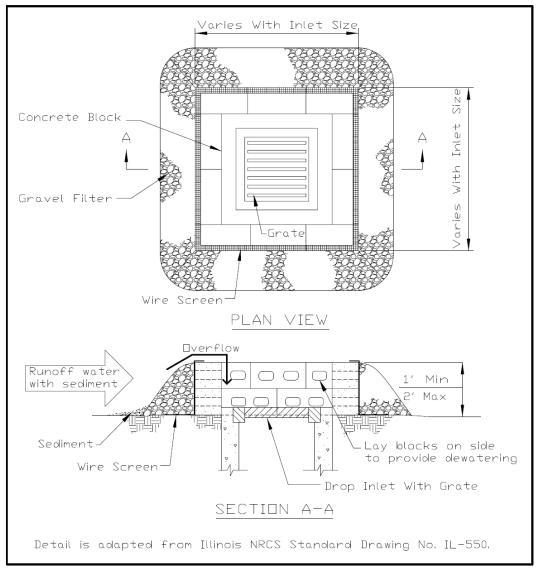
Typical Details of Block and Gravel Inlet Protection
